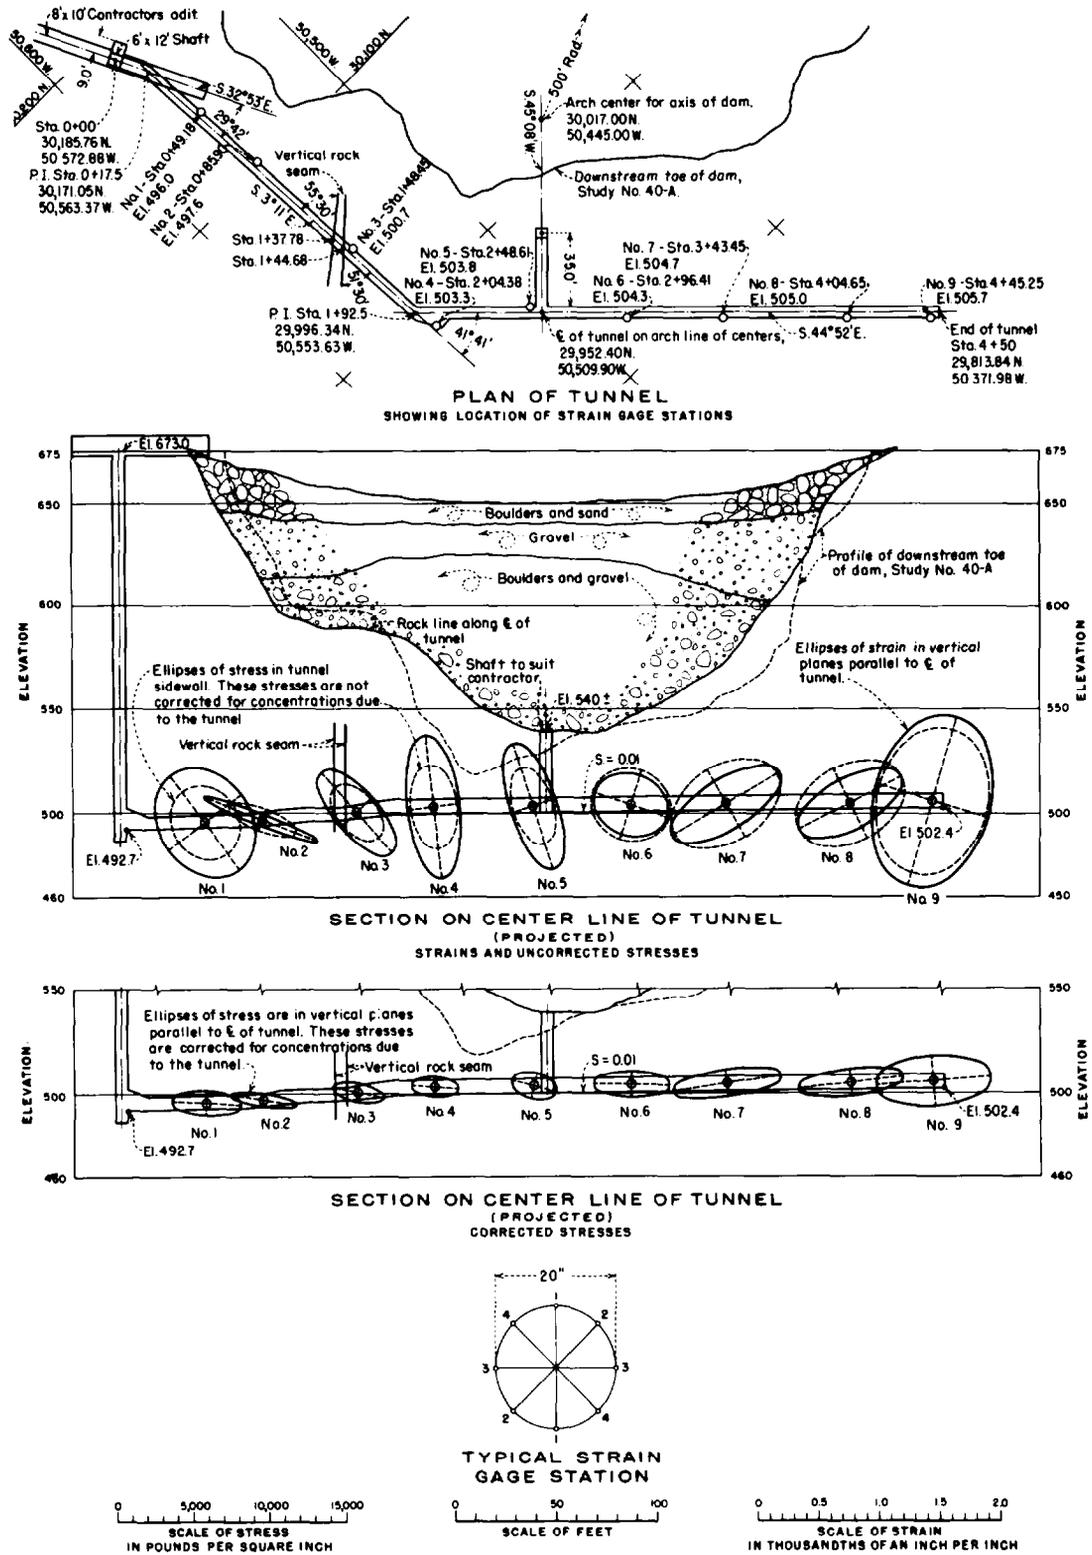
Hoover Dam studies—stresses in canyon floor.—288-D-617
